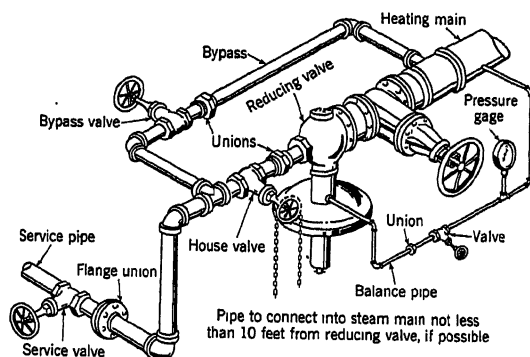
CONNECTIONS FOR REDUCING VALVES OF SIZE 4 IN. AND LARGER, AND FOR EXPANDED VALVES
